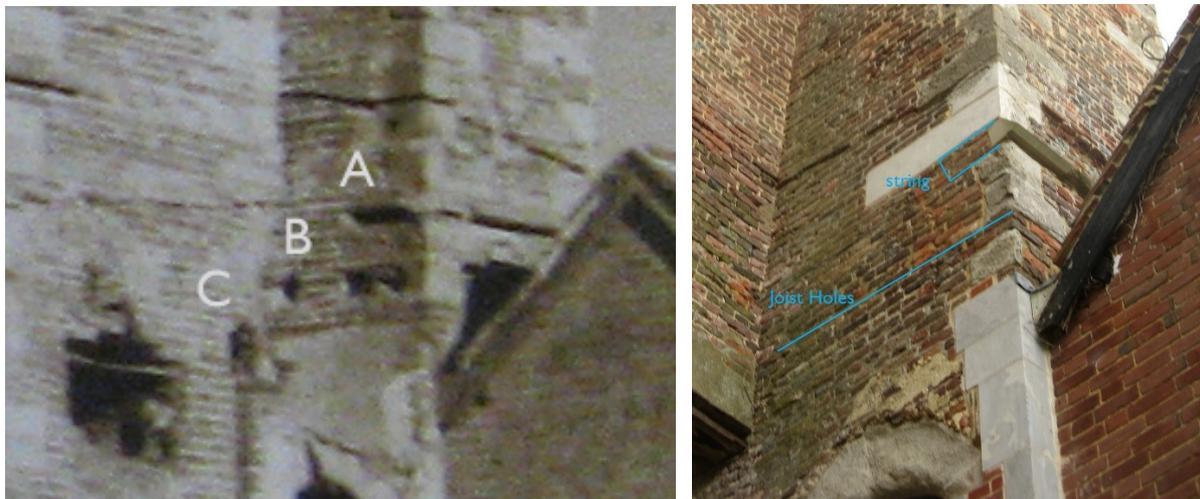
The north-west stair tower at second floor level in 1934 and 2017 showing (A) weathering course returning but now cut off; (B) gallery roof joist sockets now lost; (C – 1934 only) socket for bead of timber frame of west wall of the west gallery. Note extensive survival of internal plasterwork below joists 'B' in 1934; barely a fragment now remains
